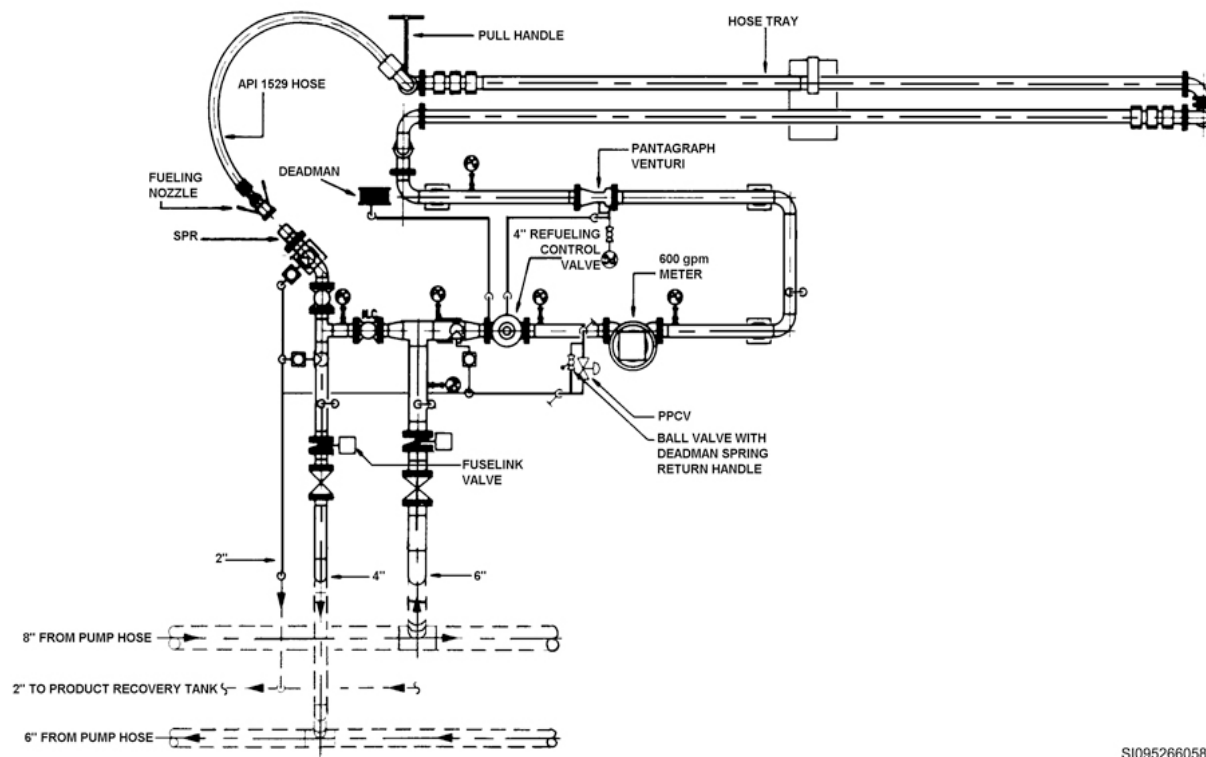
Hot pit hose end pantograph. (By courtesy of Cla-Val Co.)
